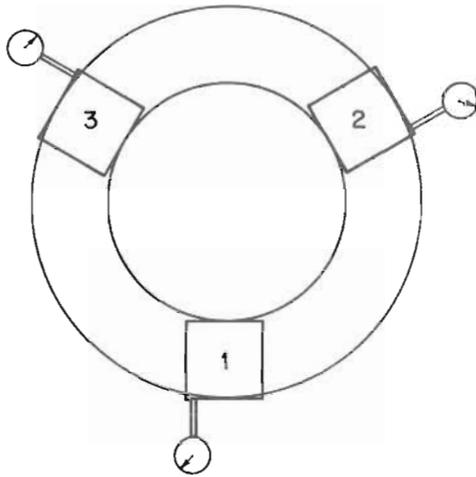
Donut crib shown with installed hydraulic flatjack.
